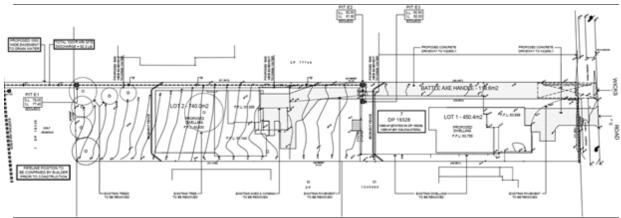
Extract of proposed subdivision plan. Source: ALW Design, 2020
